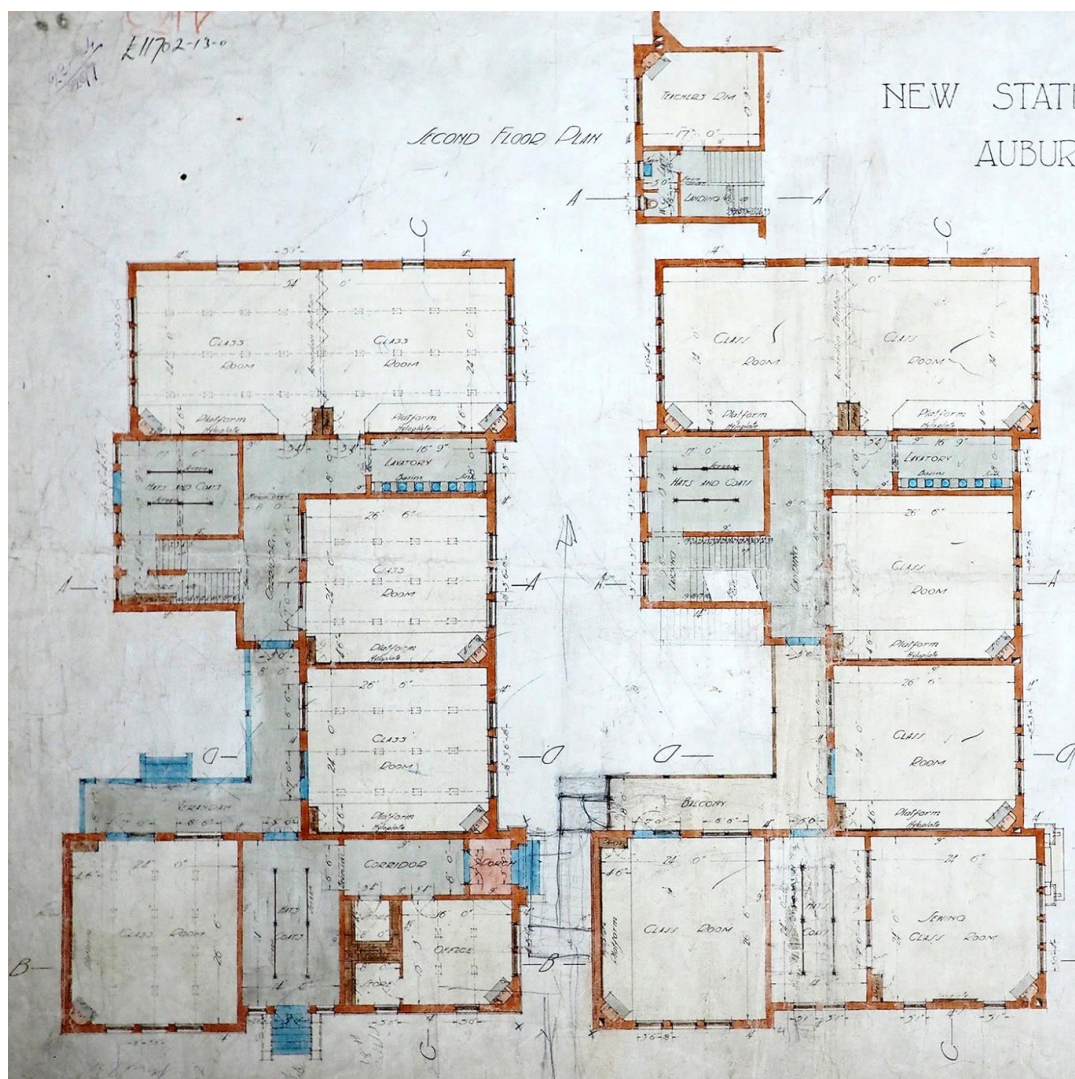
Original floor plans showing the ground floor plan (left), first floor plan (right) and second floor plan only containing the head teacher's room (top right). (Source: PROV VPRS3686/P0006/4045)
